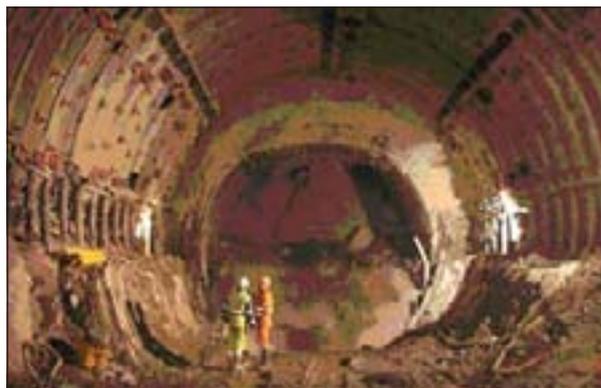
Deformable support system for high rock stress and big deformation. From the new St Gotthard railway tunnel, photo Amberg Engineering.
